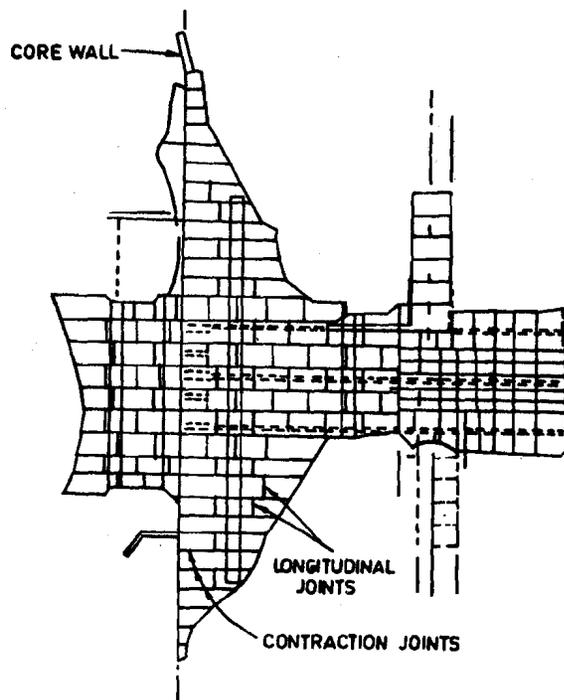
Transverse and Longitudinal Joints in Bhakra Dam
